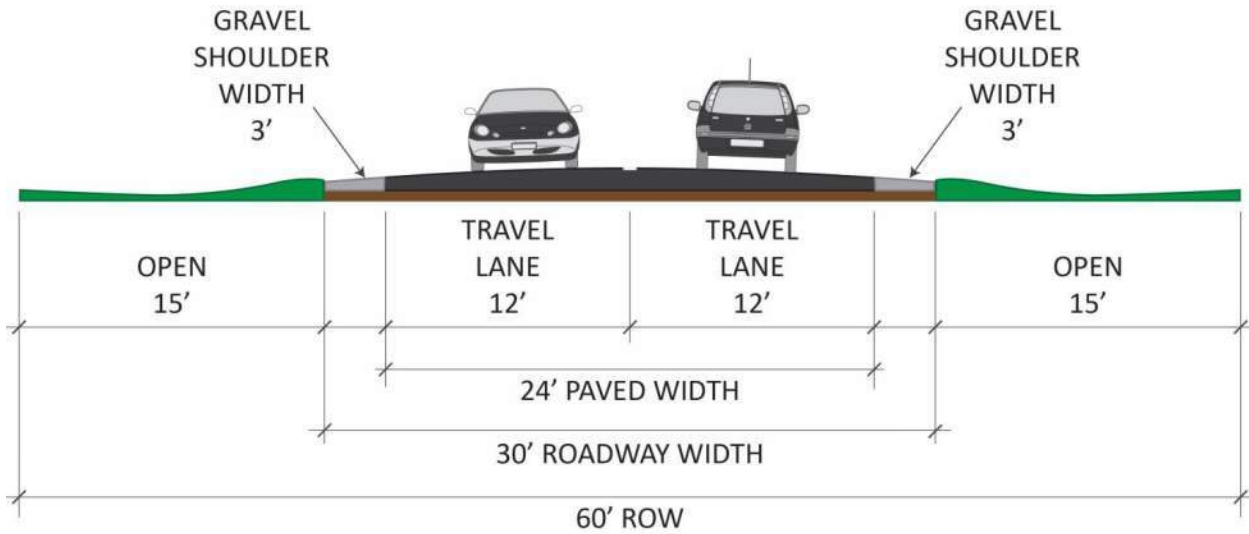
Paved County Roads (Collector or Local Roads)
